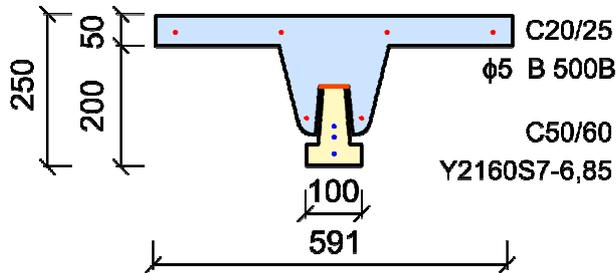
Cross-Section of Composite Concrete Floor Beam
